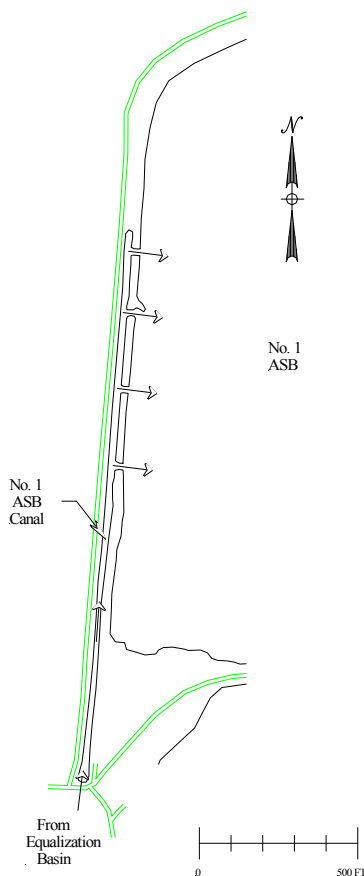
Scale Drawing of the Mill T No. 1 ASB Canal
